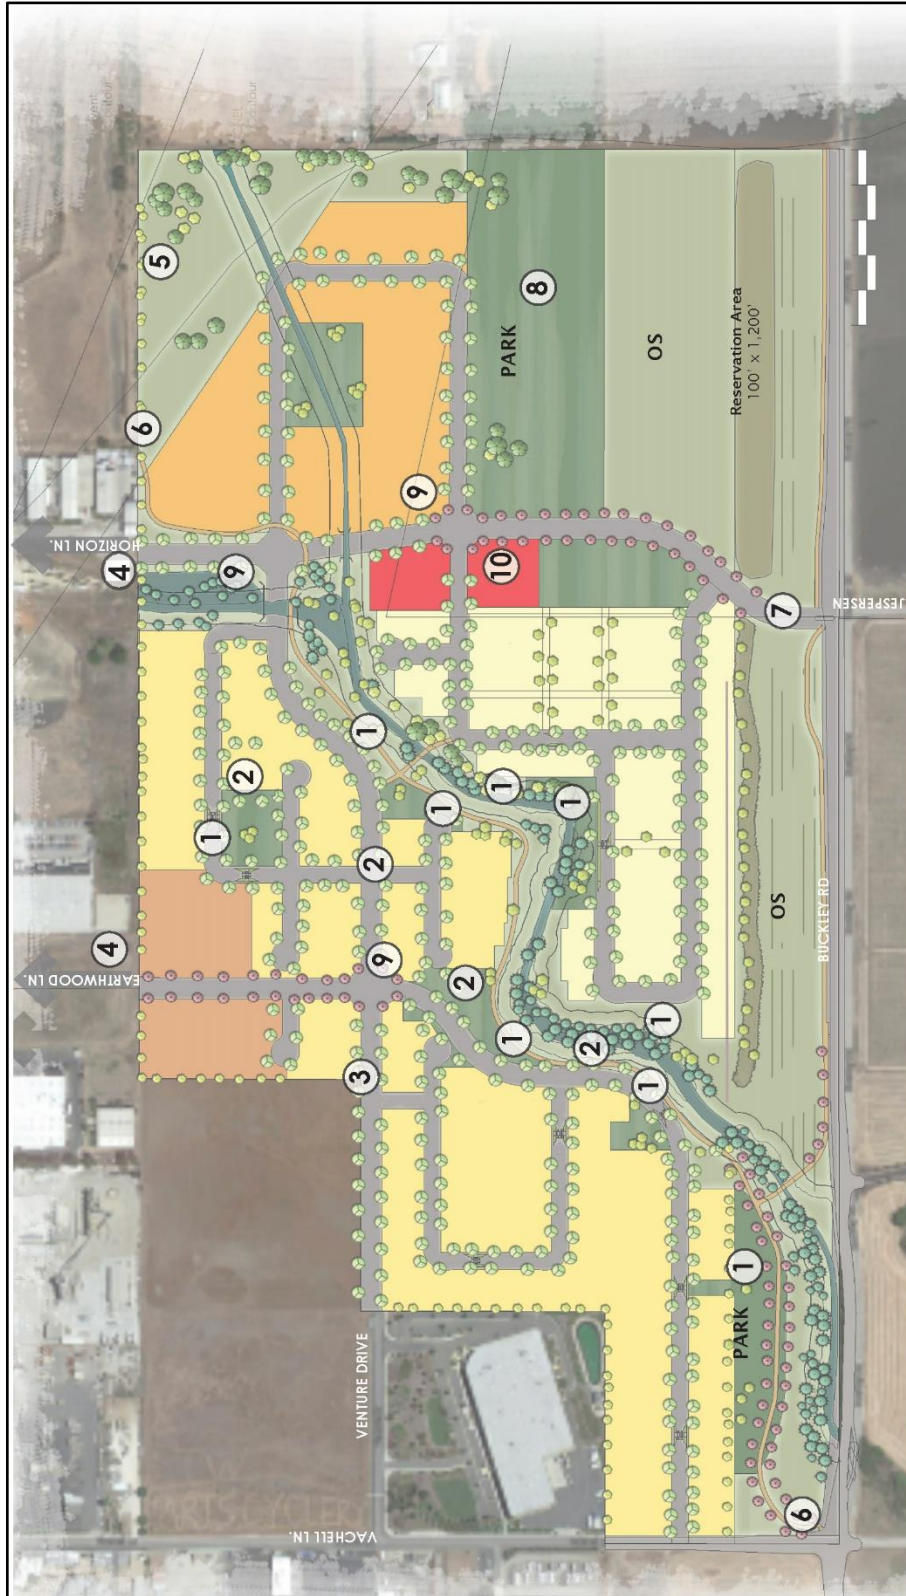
Avila Ranch Site Plan - Overview of Key Design Features
